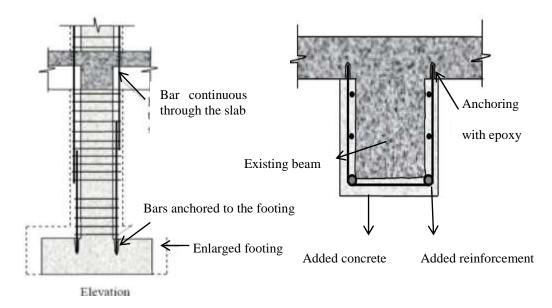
(a) Concrete jacketing of column (b) Concrete jacketing of beam (CPWD 2007)
